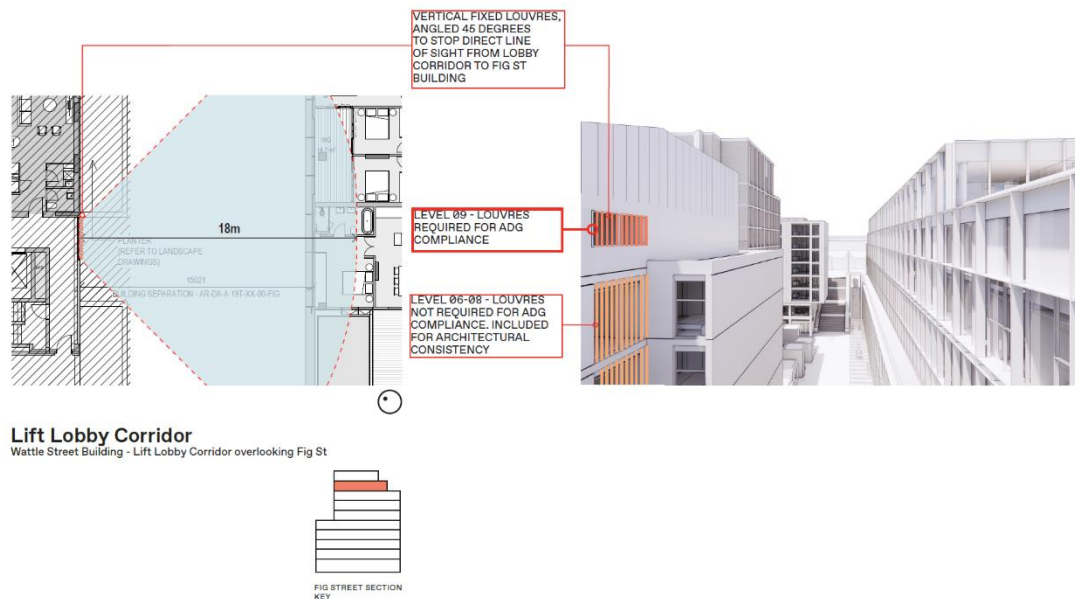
Privacy protection measures - Louvres: Fig Street Building to Wattle Street Building
